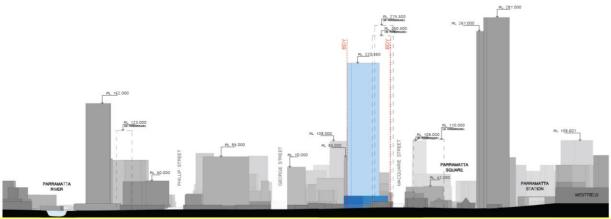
Church Street section including the proposal Source: Urban Design Analysis
